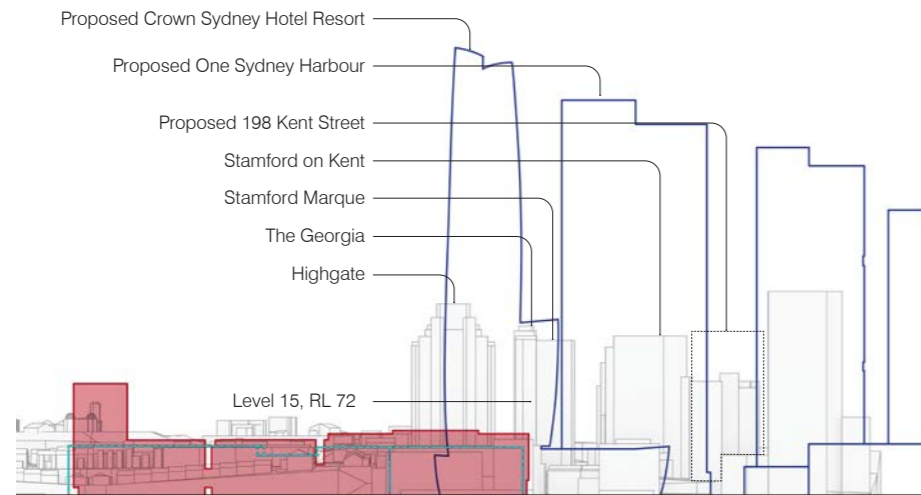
Elevation Looking East - MOD 9 with the Approved Concept Plan shown in light blue outline (Source: Modified from HASSELL diagrams (October 2020))
